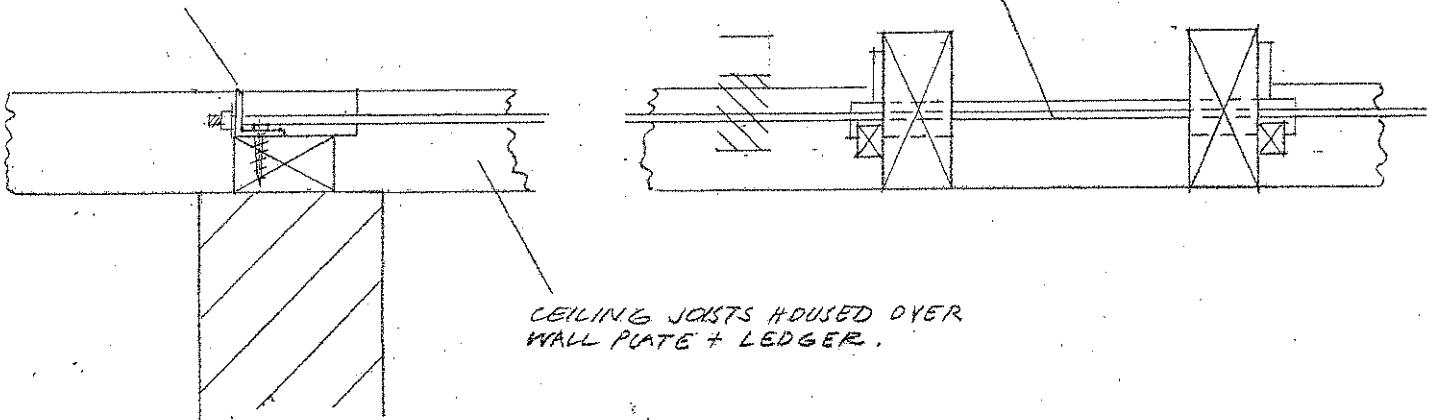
N-S (TYPE 3) ROOF TIE ABOVE LOBBY Scale 1:10
